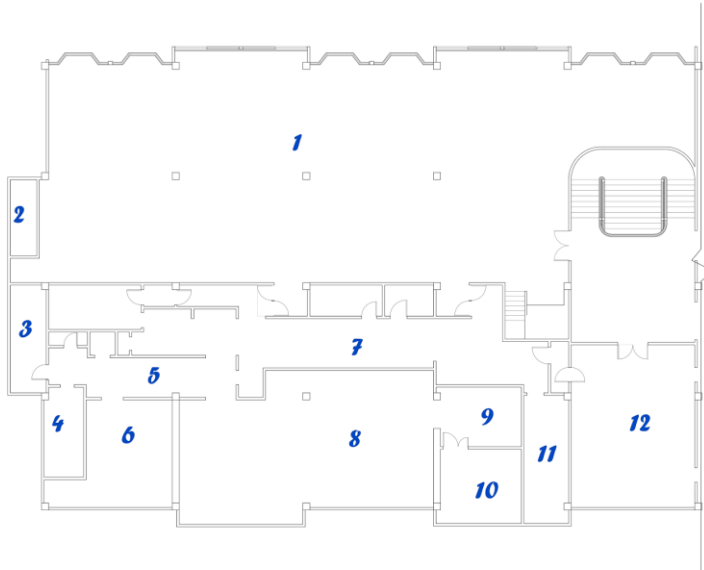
(b) First Floor Plan Layout (Measure Drawing Group 3 team, Teo 2017)
